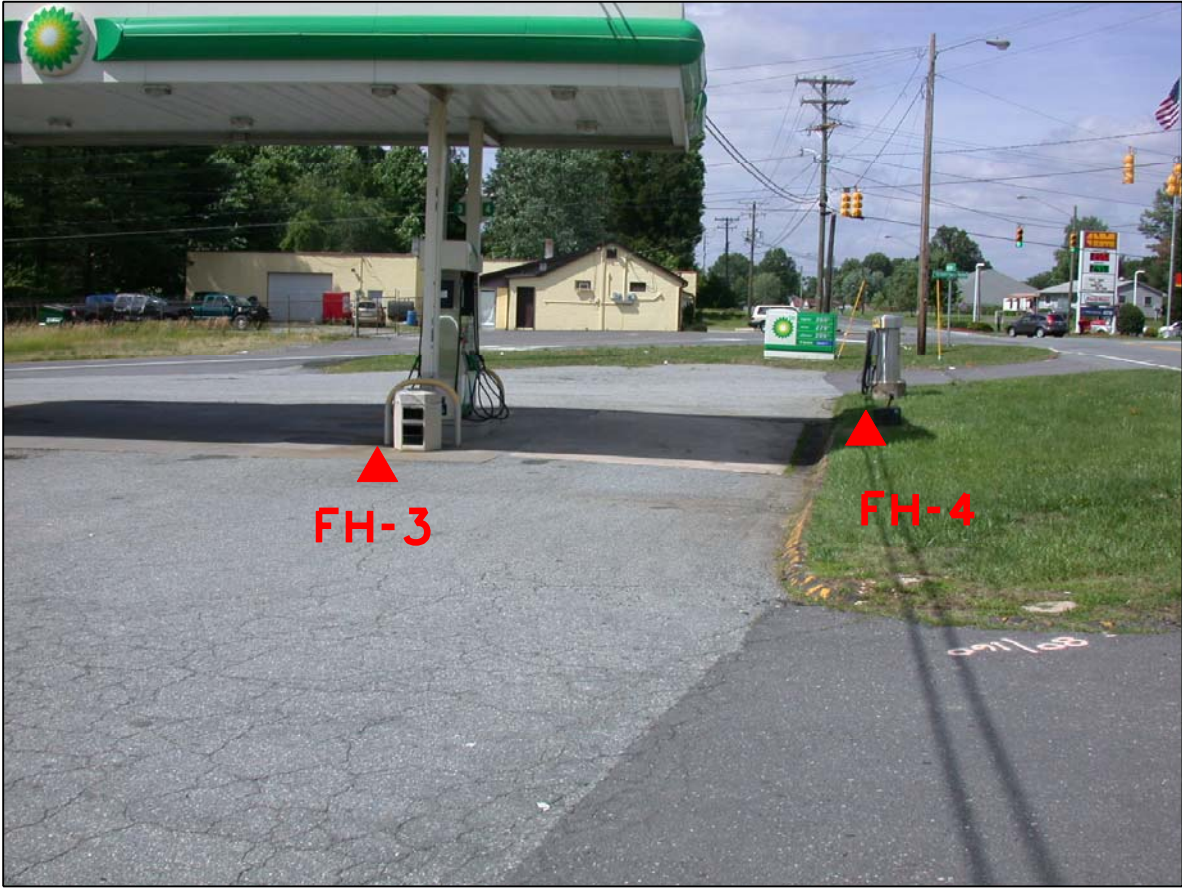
BORINGS IN PROPOSED R/W LOOKING SOUTHWEST
